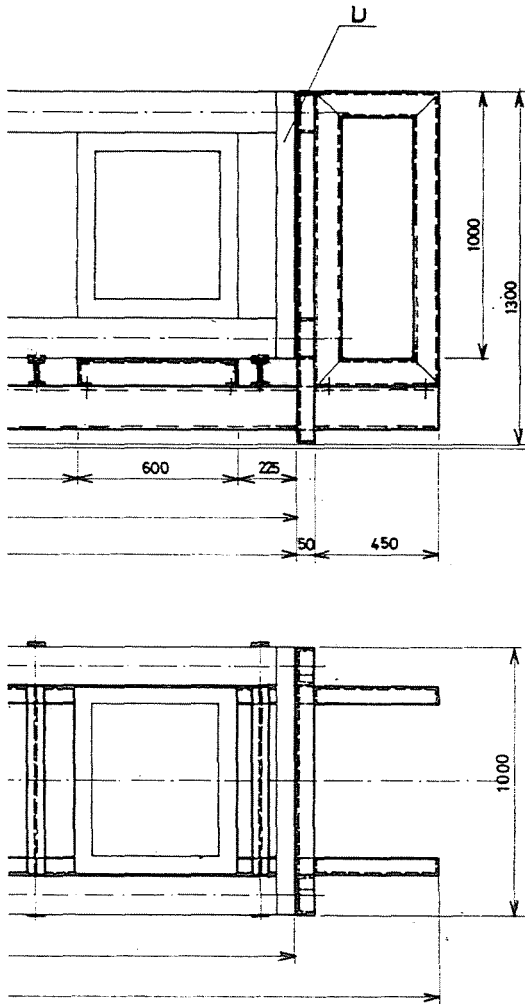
and Fig. 22b Bench for preassembly of heterogeneous pillar skeleton frames (tectonic structural small box-units). Index: A. R.c. column element; B. Upper cradle; C. Diaphragm; D. Lower cradle; 1. longitudinal beam; 2. longitudinal stiffening frame; 3. Cross stiffening frame; 4. Cross-beam; 5. Box element; 6. Pressing spindle
